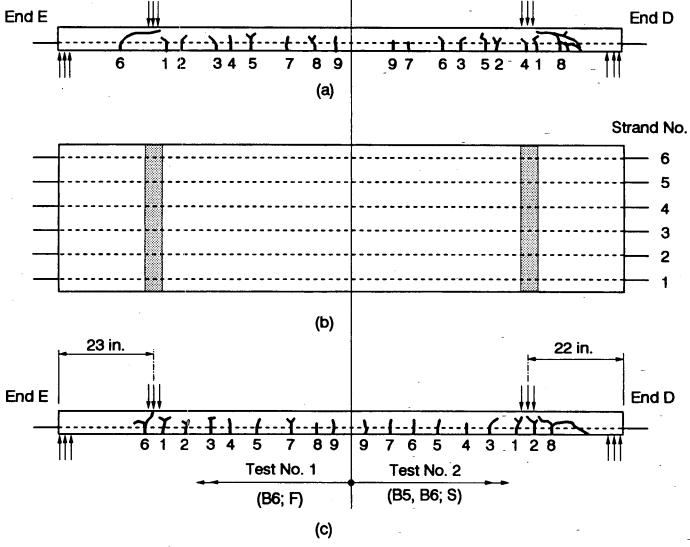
Crack patterns for D-type Specimen No. 12-6.0DC-3:
